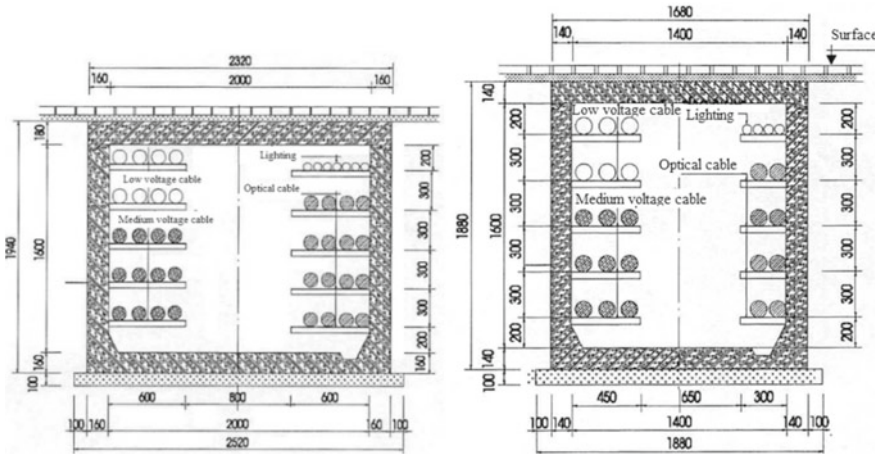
The cross section of cut and cover tunnel in National Road N°32 [9]
